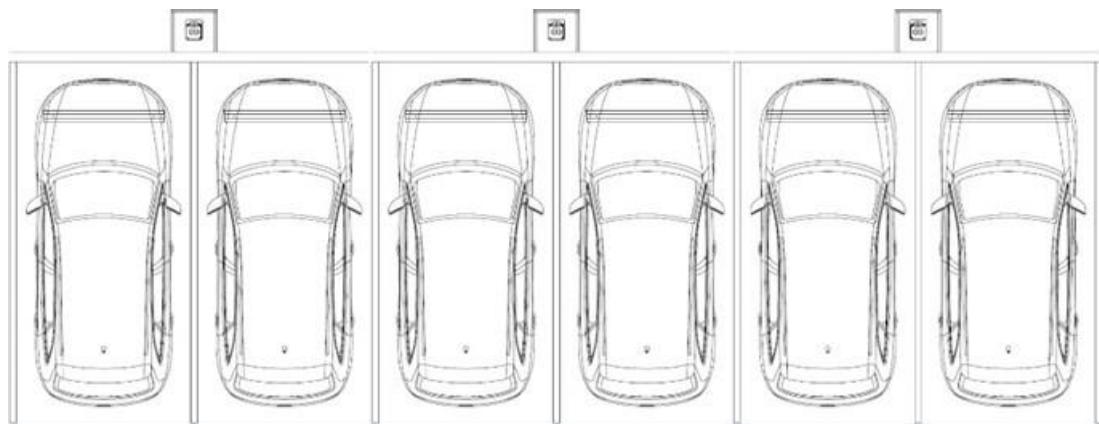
INDICATIVE 6 BAY LAYOUT
